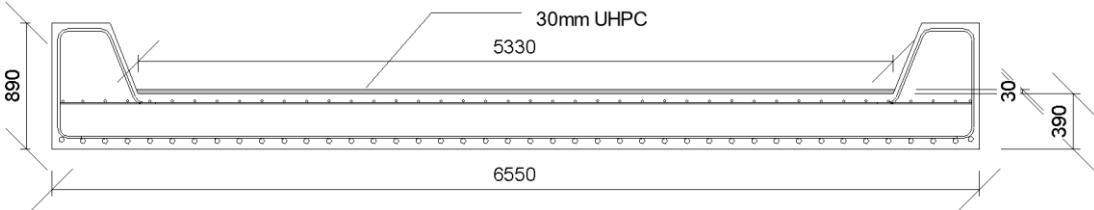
Bridge cross-section where a 30 mm UHPC overlay is applied at the top of the bridge deck
